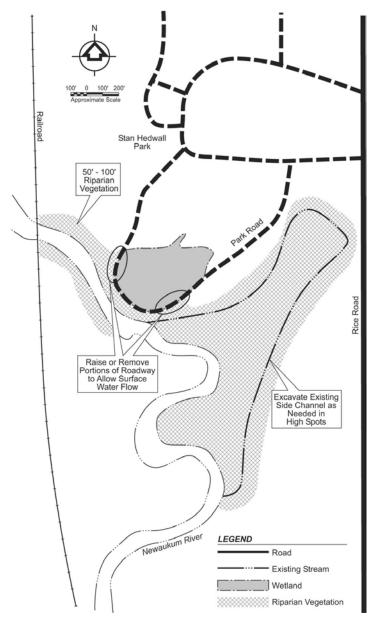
Newaukum Reconnection and Wetland Creation, Stan Hedwall Park
